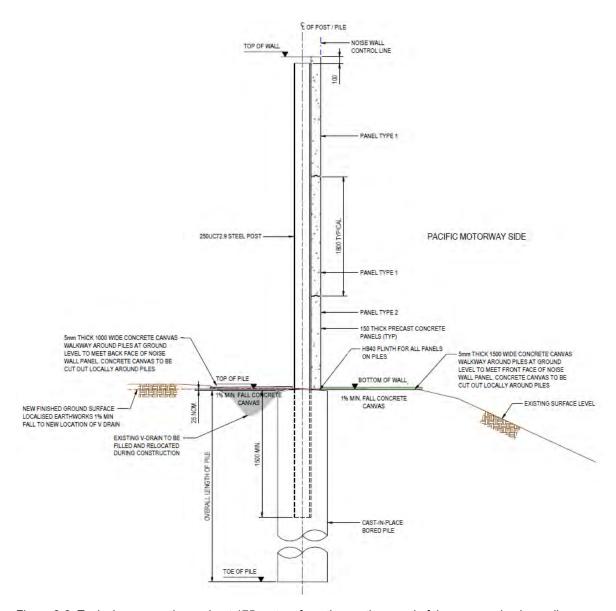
Typical cross section – about 175 metres from the southern end of the proposed noise wall
